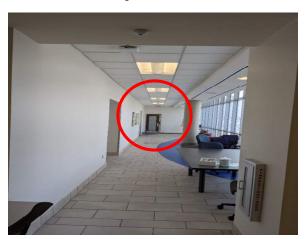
Excessive negative air pressure on the 4<sup>th</sup> Floor causing the corridor door opposite the mechanical room to open.
